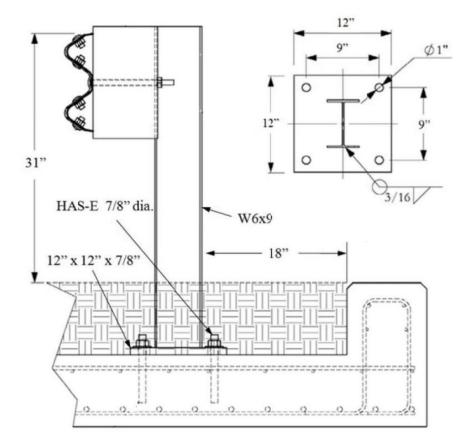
MASH-Compliant, MGS Guardrail Attachment to Low-Fill Culvert [8]
